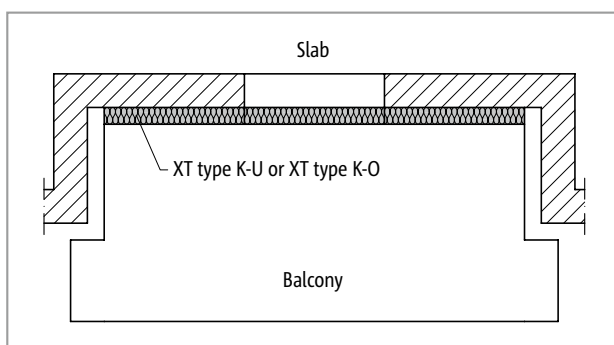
Schöck Isokorb® XT type K-U/K-O: Balcony with facade offset
